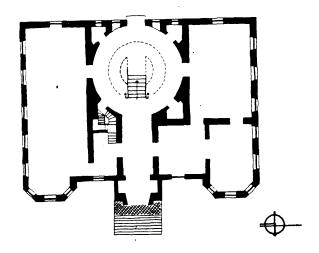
Floor plans and section of Qavam-os-Saltana
